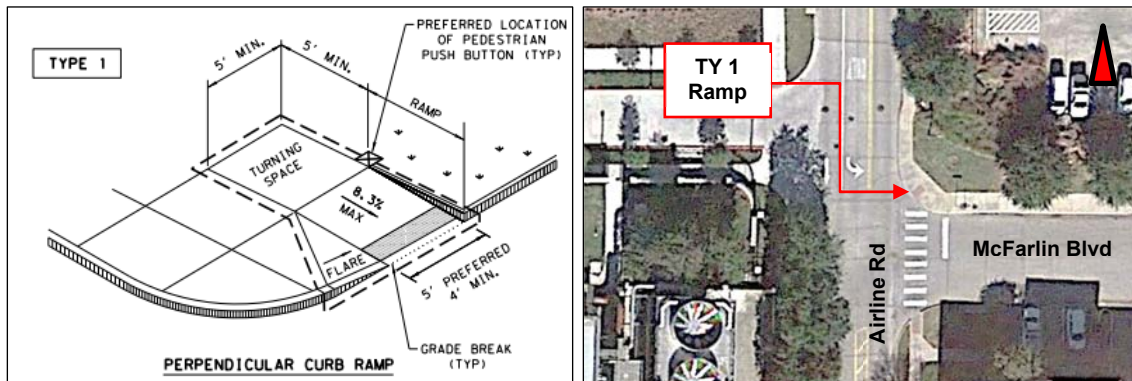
TxDOT PED-18 Ramp Detail & Google Earth Aerial
